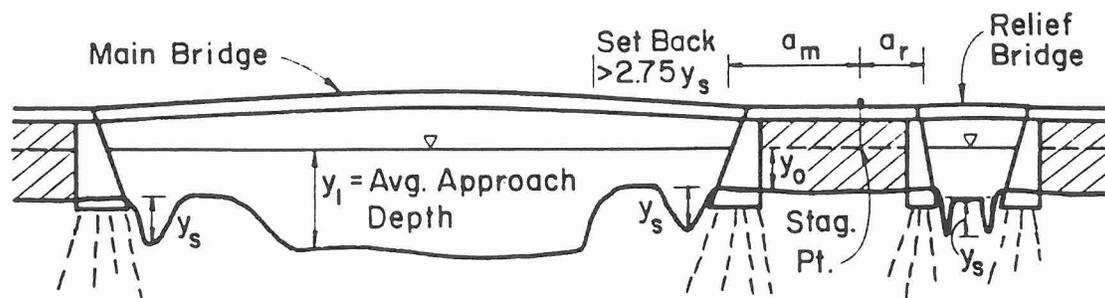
BRIDGE ABUTMENT SET BACK FROM MAIN CHANNEL BANK AND RELIEF BRIDGE
